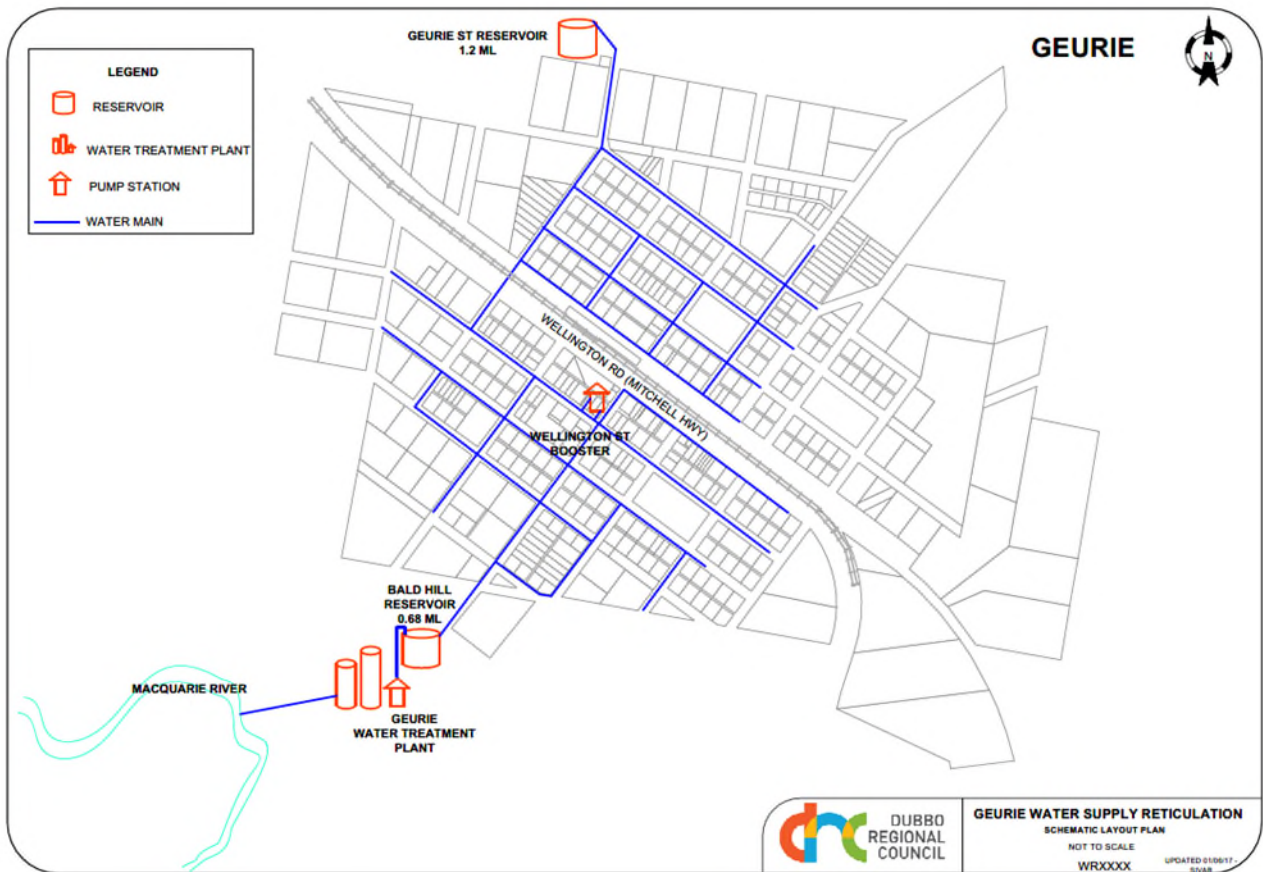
Geurie Water Supply Reticulation Schematic Layout Plan
